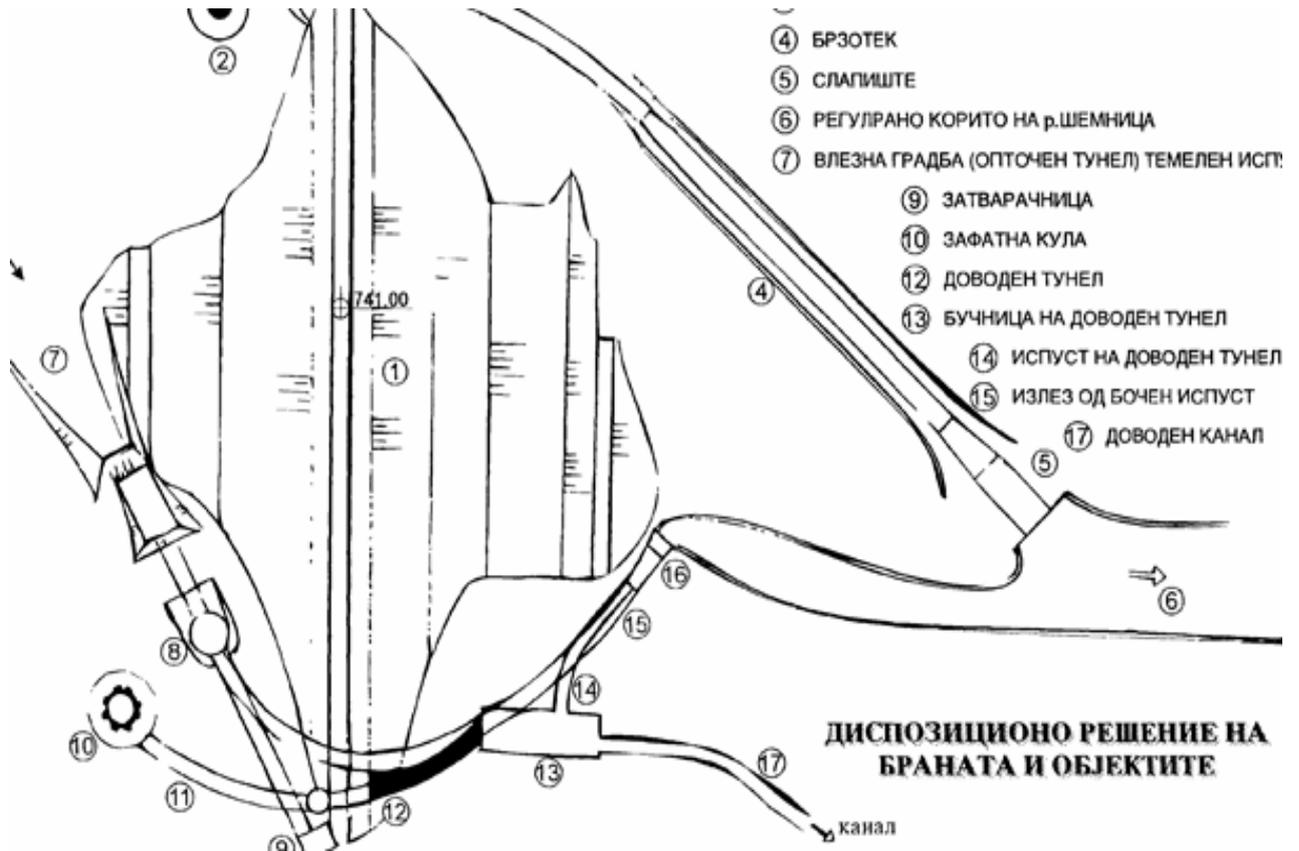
Layout of the dam "Strezevo" with the accompanying facilities
